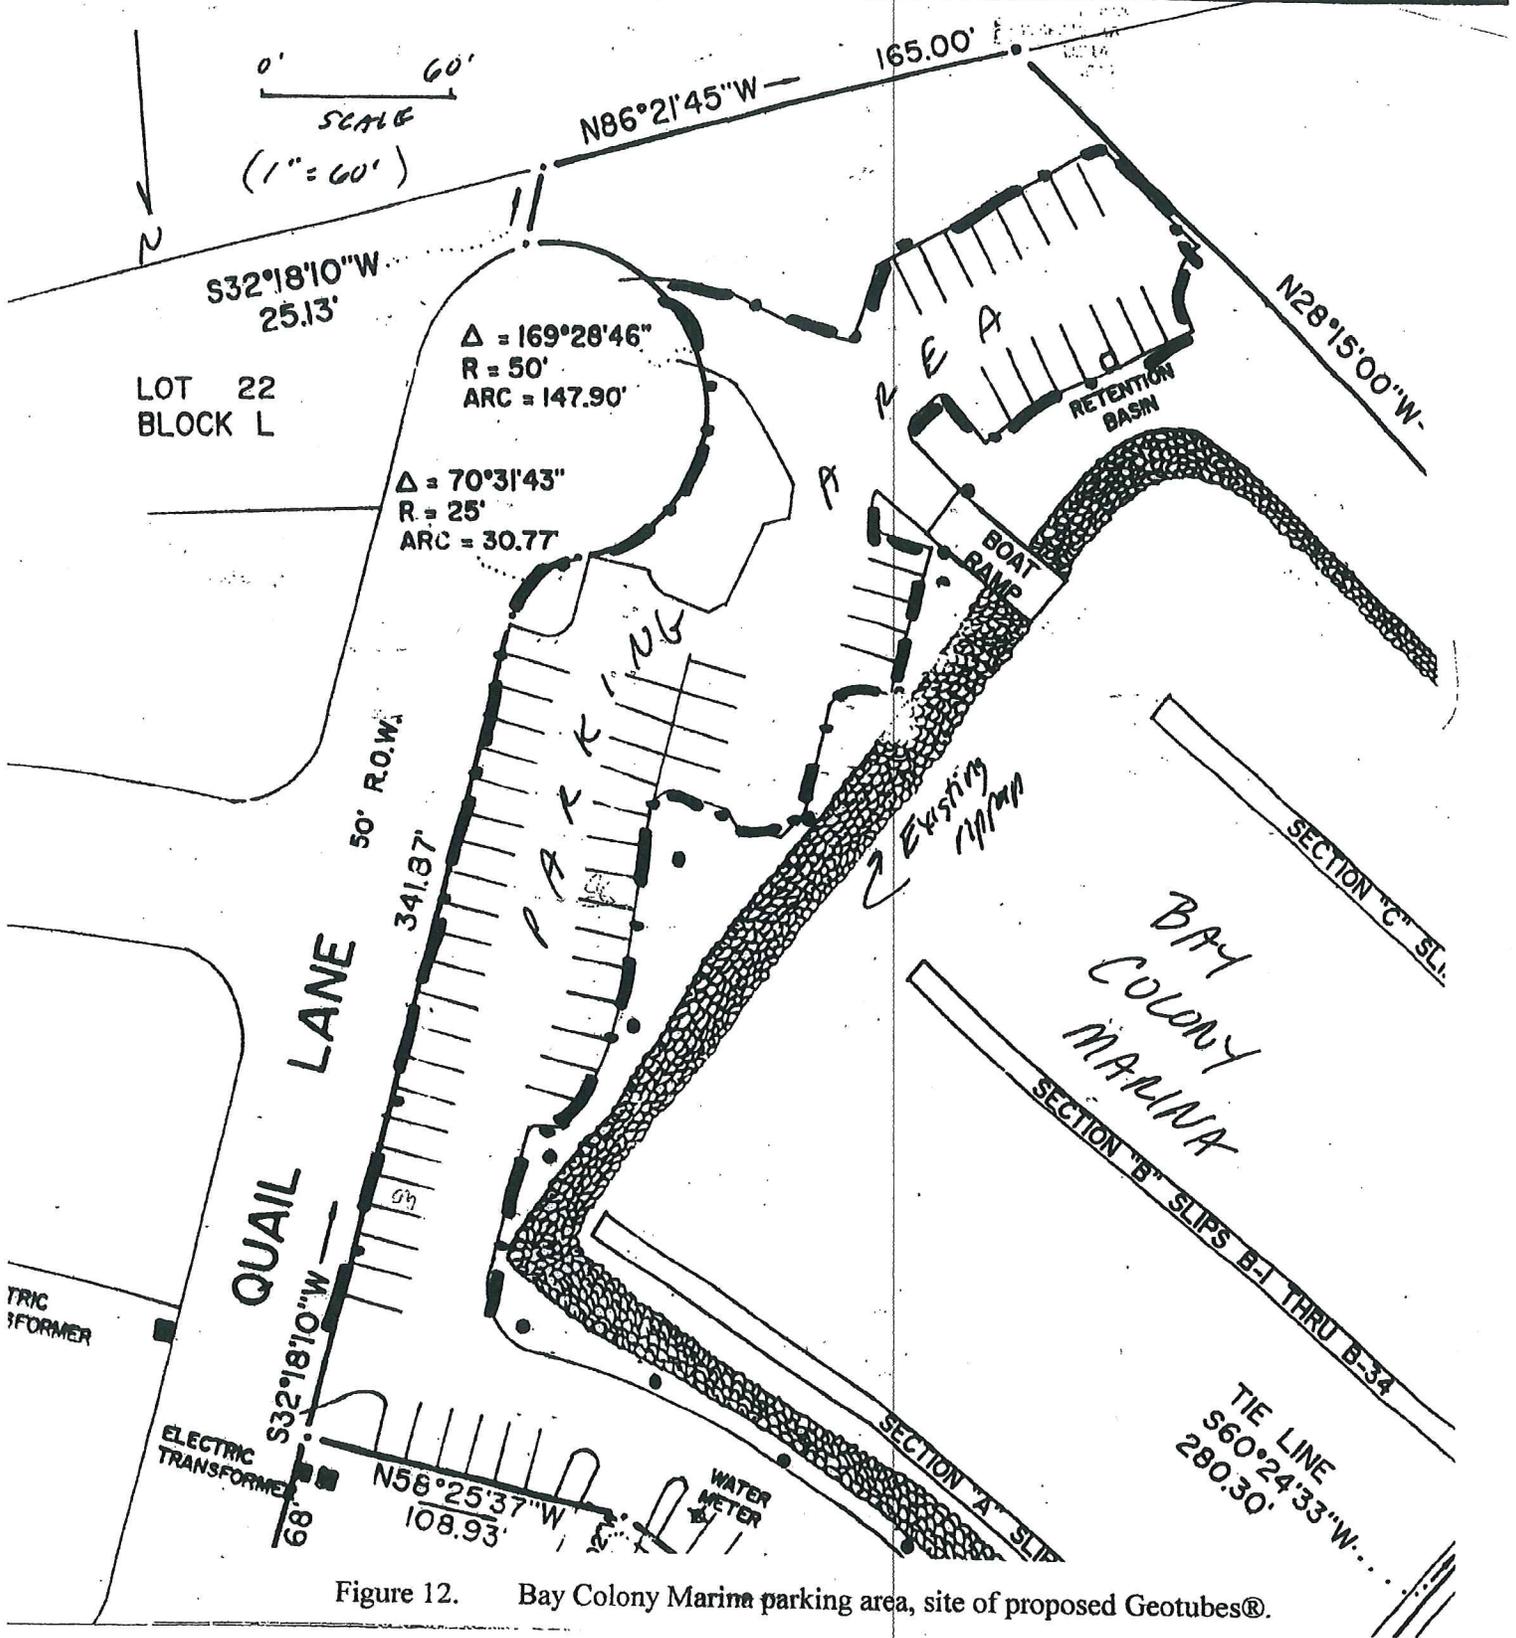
Bay Colony Marina parking area, site of proposed Geotubes®.
